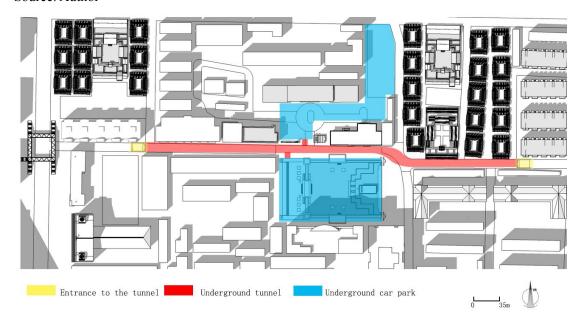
The Underground tunnel and car park in Yongding Road historic district
